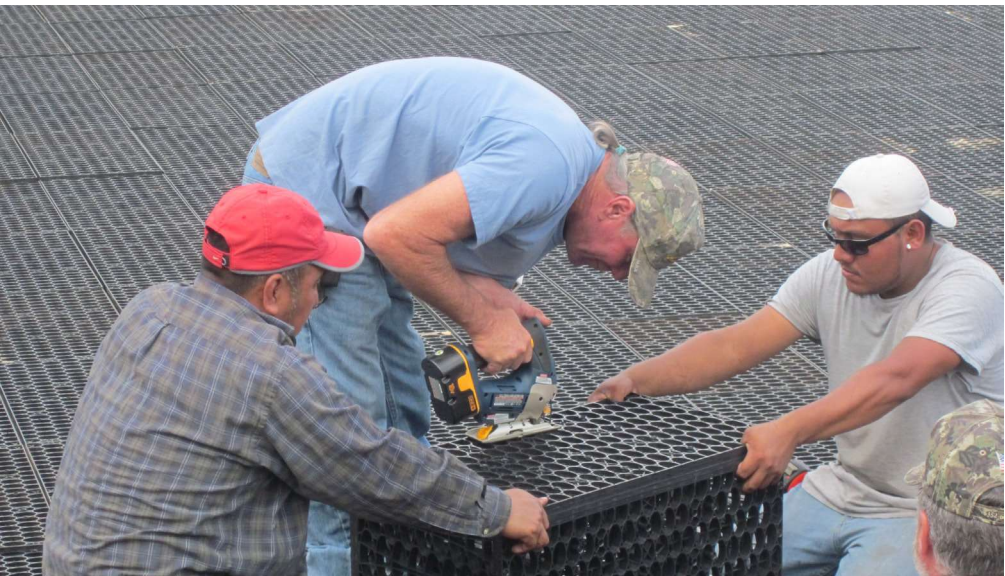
For UD modules, two internal plates are removed, and two half-pieces are reinserted perpendicular to the other internal pieces.
